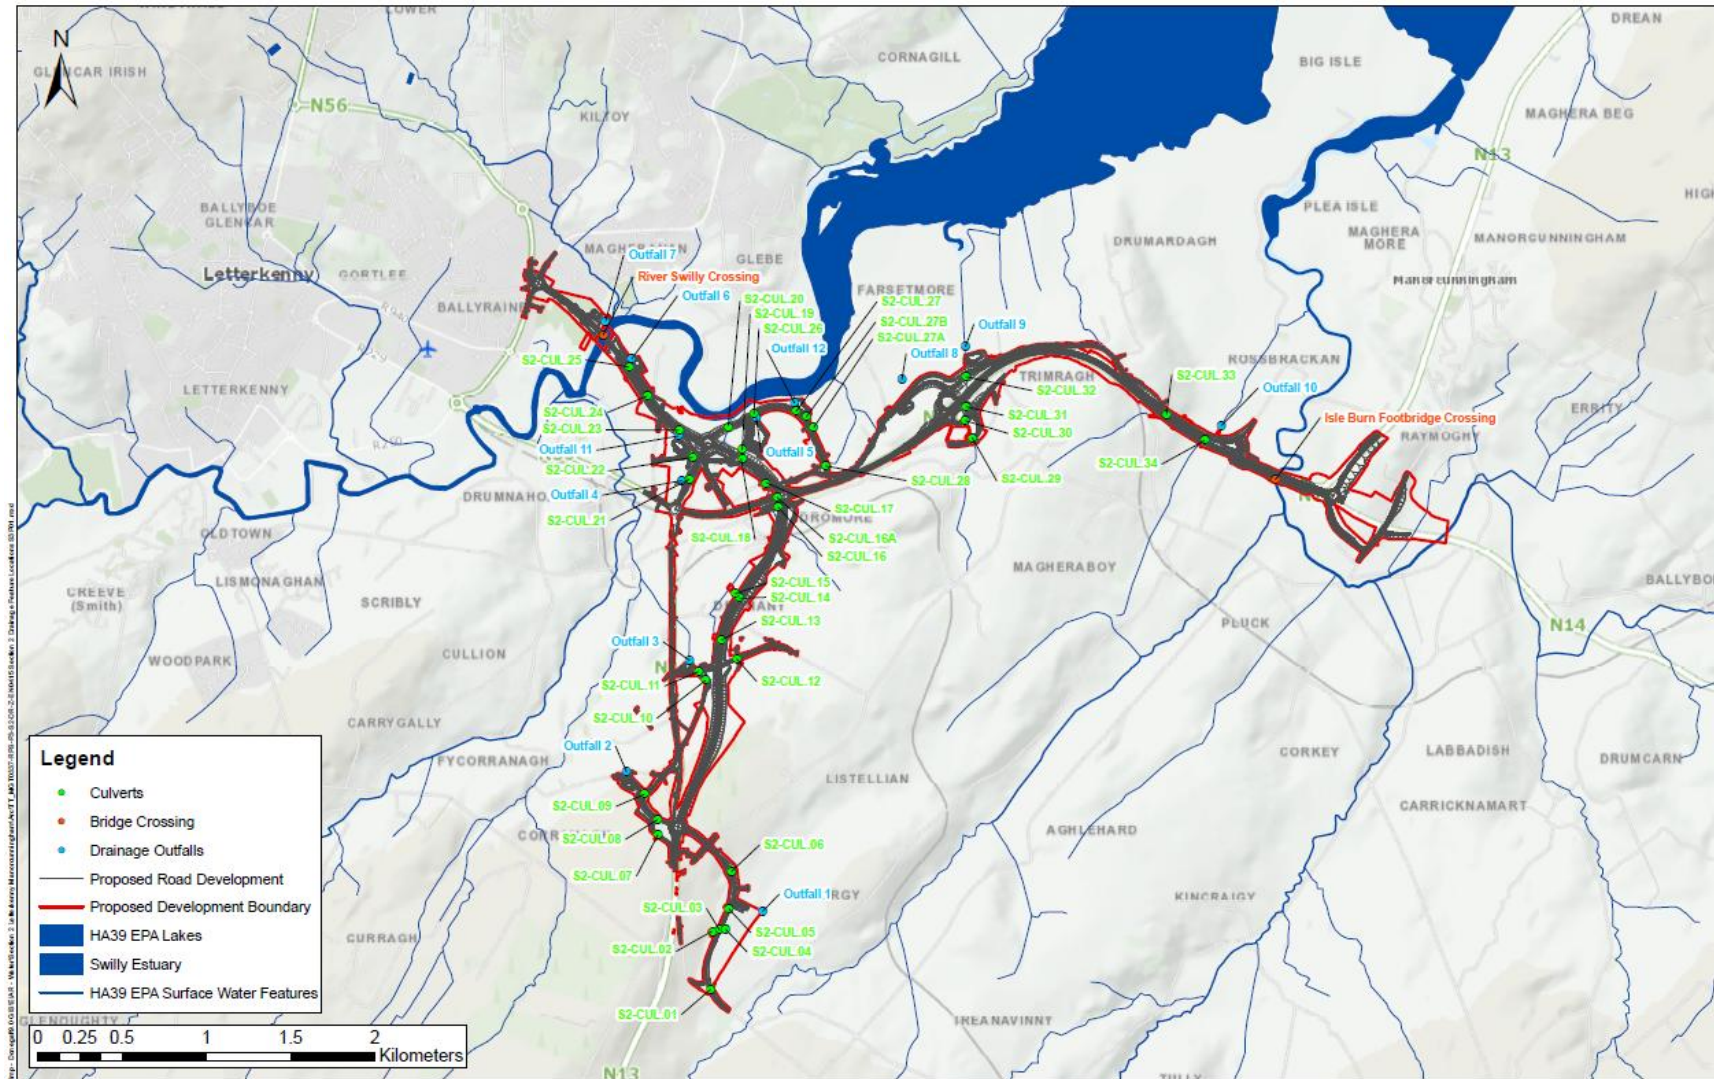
Locations of Bridges / Culvert Crossing and Drainage Outfalls
